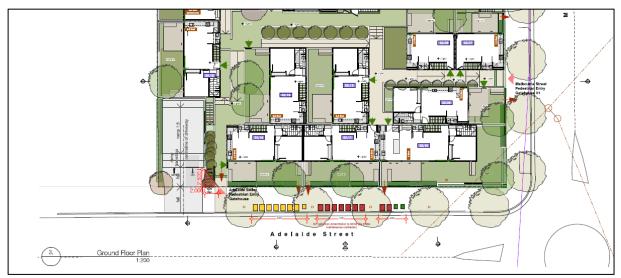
Amended Ground Floor Plan including bin presentation to Street kerb
